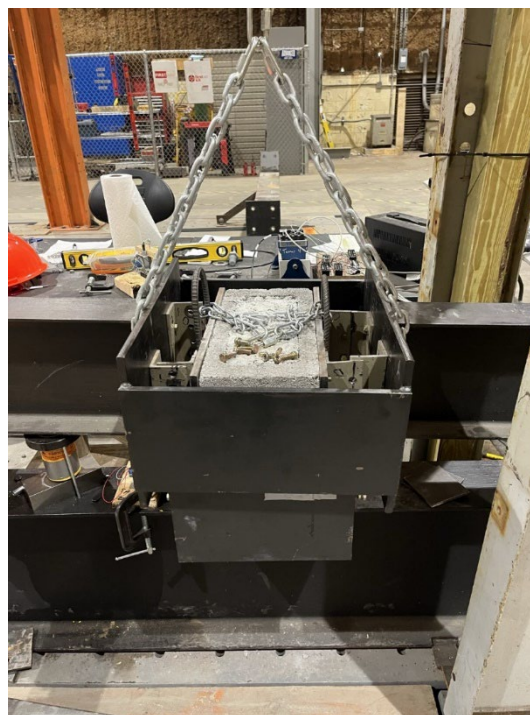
C1072 specimen installed in Bond Wrench and connected to Member 6
